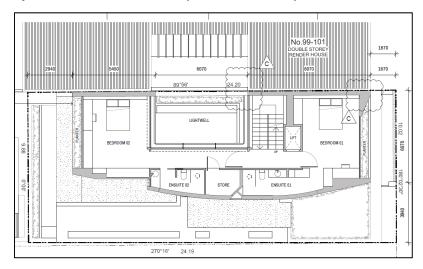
first floor – noting the extended light court and the shift closer to Millswyn St
